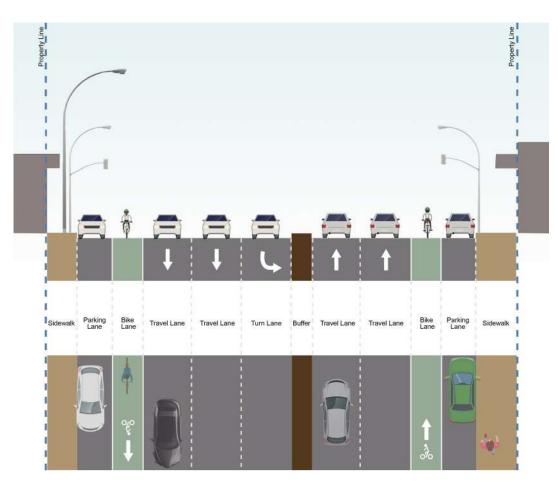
Existing Street Section - E. Ventura Ave. @ 1st St.
